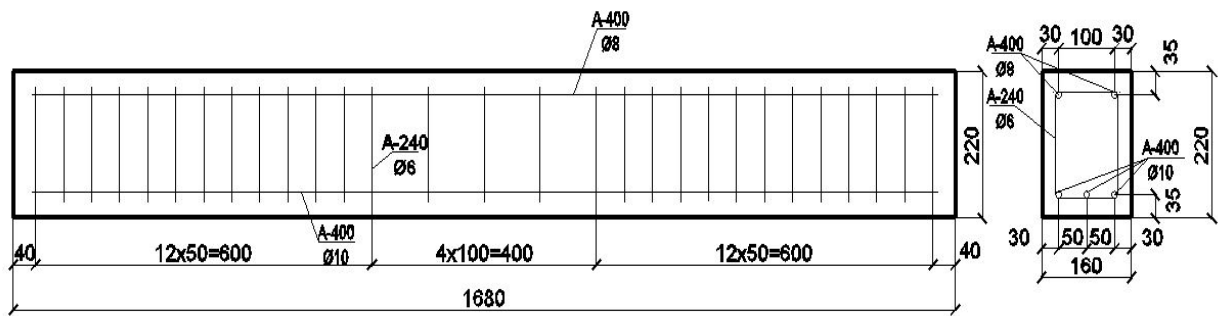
Reinforcement scheme for a reinforced concrete laboratory sample (Ящук, 2017a; Ящук, 2017b)
